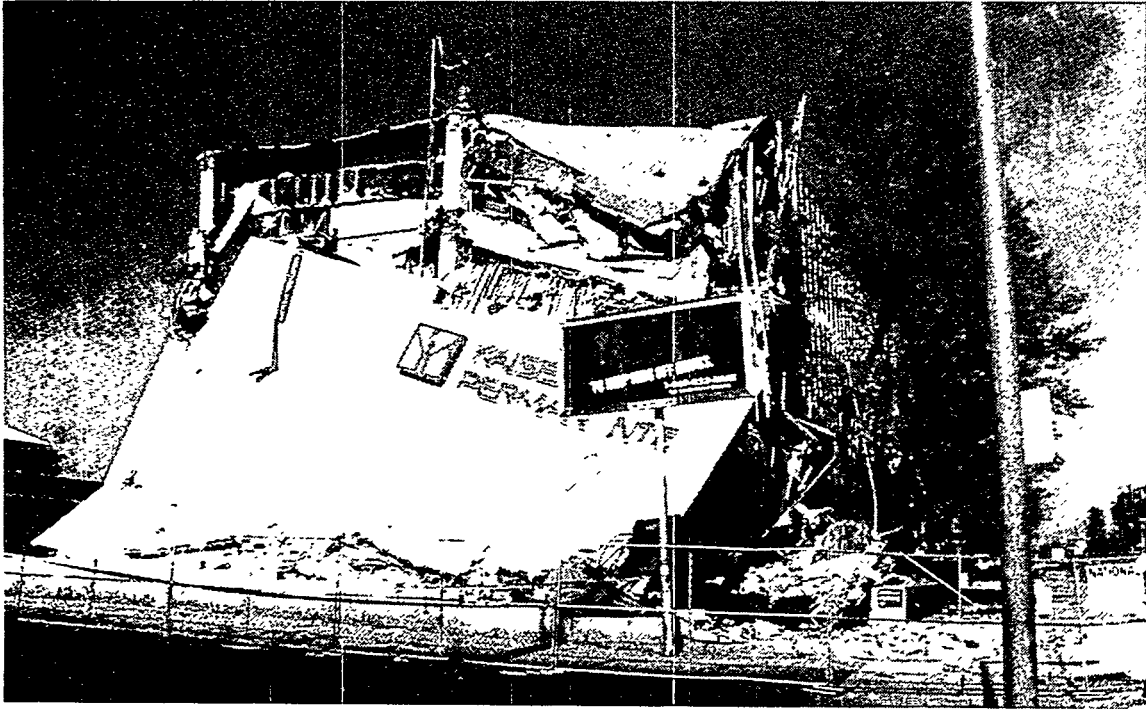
An example of a nonductile reinforced concrete frame building which collapsed is the Kaiser Permanente Medical Office Building in Granada Hills.
